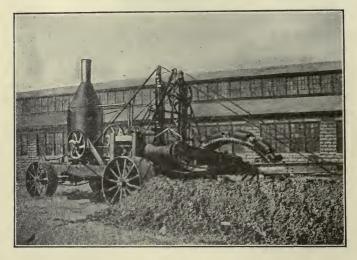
Tile-ditching machine opening a 4-foot ditch.
